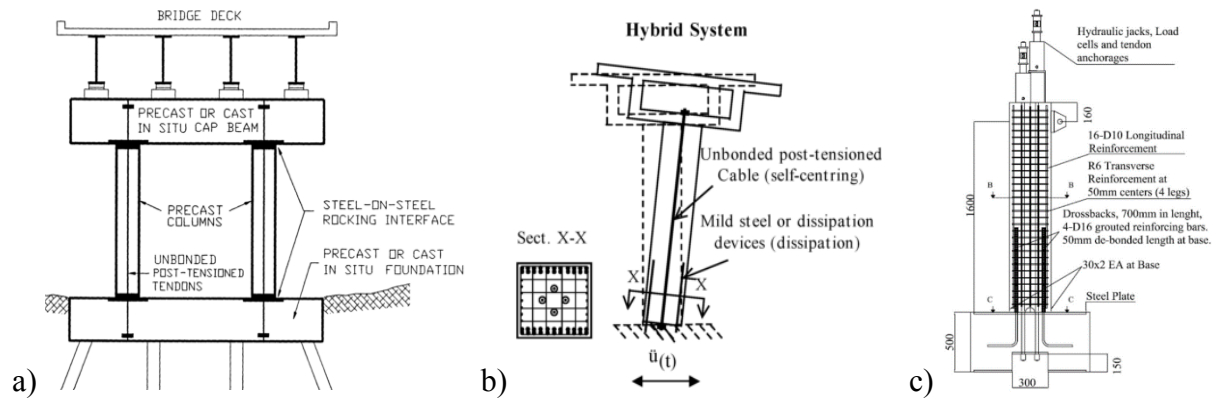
a) Controlled rocking pier bent [18]. b) Proposed application of PRESSS to bridges showing possible design [19]. c) Design schematic of a cantilever PRESSS column used in experimental testing [20].
